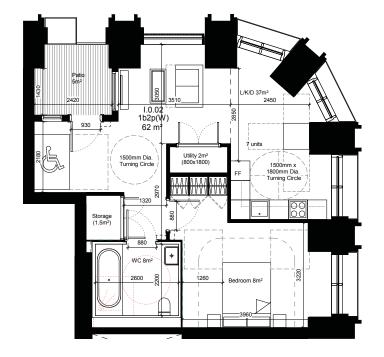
Typical Wheelchair Accessible Apartment Plans
